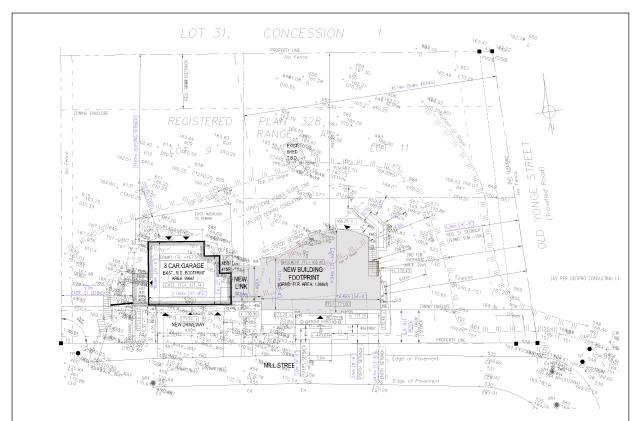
Site Plan for proposed new dwelling. The red dash-dot line is the long-term stable top-of-slope, as determined by Geopro Consulting Ltd.
